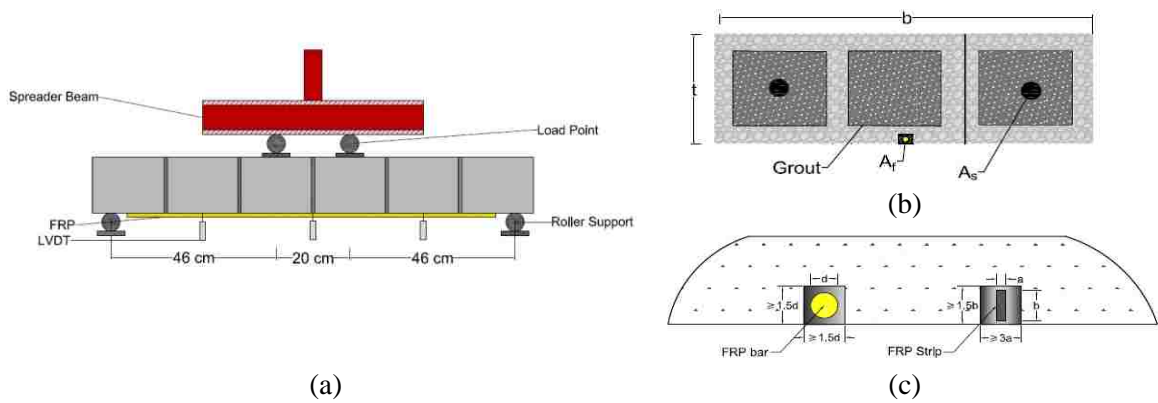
Specimen details: (a) four point load setup, (b) wall cross-section, (c) NSM groove dimension
